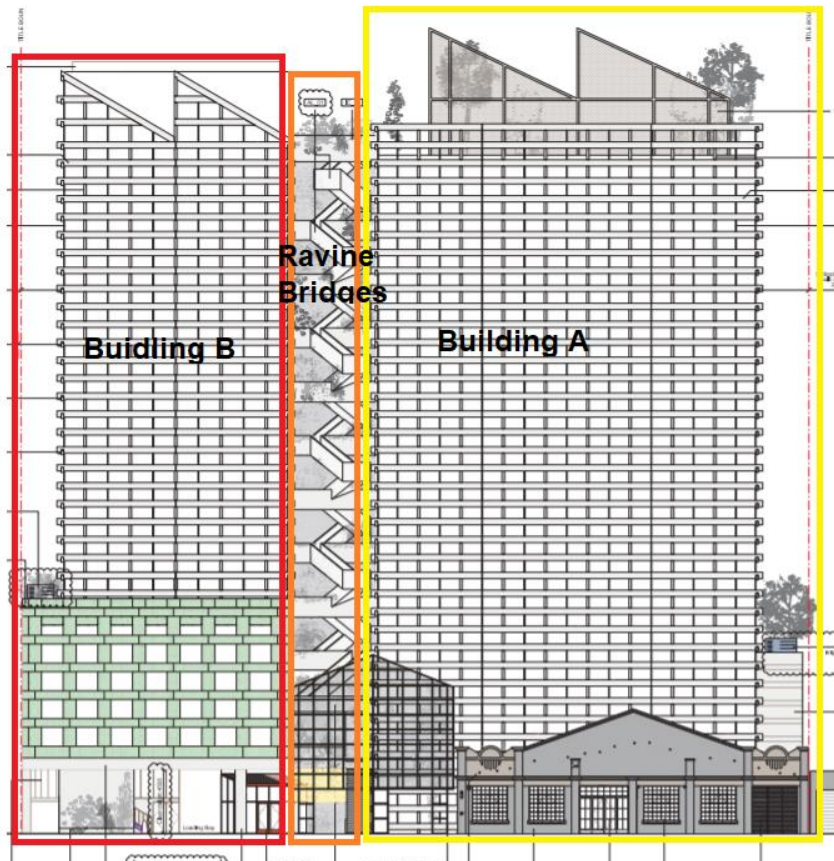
Portions / towers identified as Buildings A and B – East (Front) Elevation.
